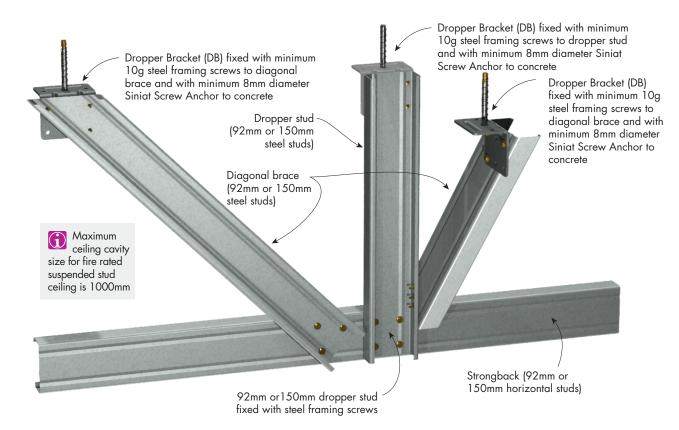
Diagonal Braces to Strongback Connection with Dropper Stud Isometric
